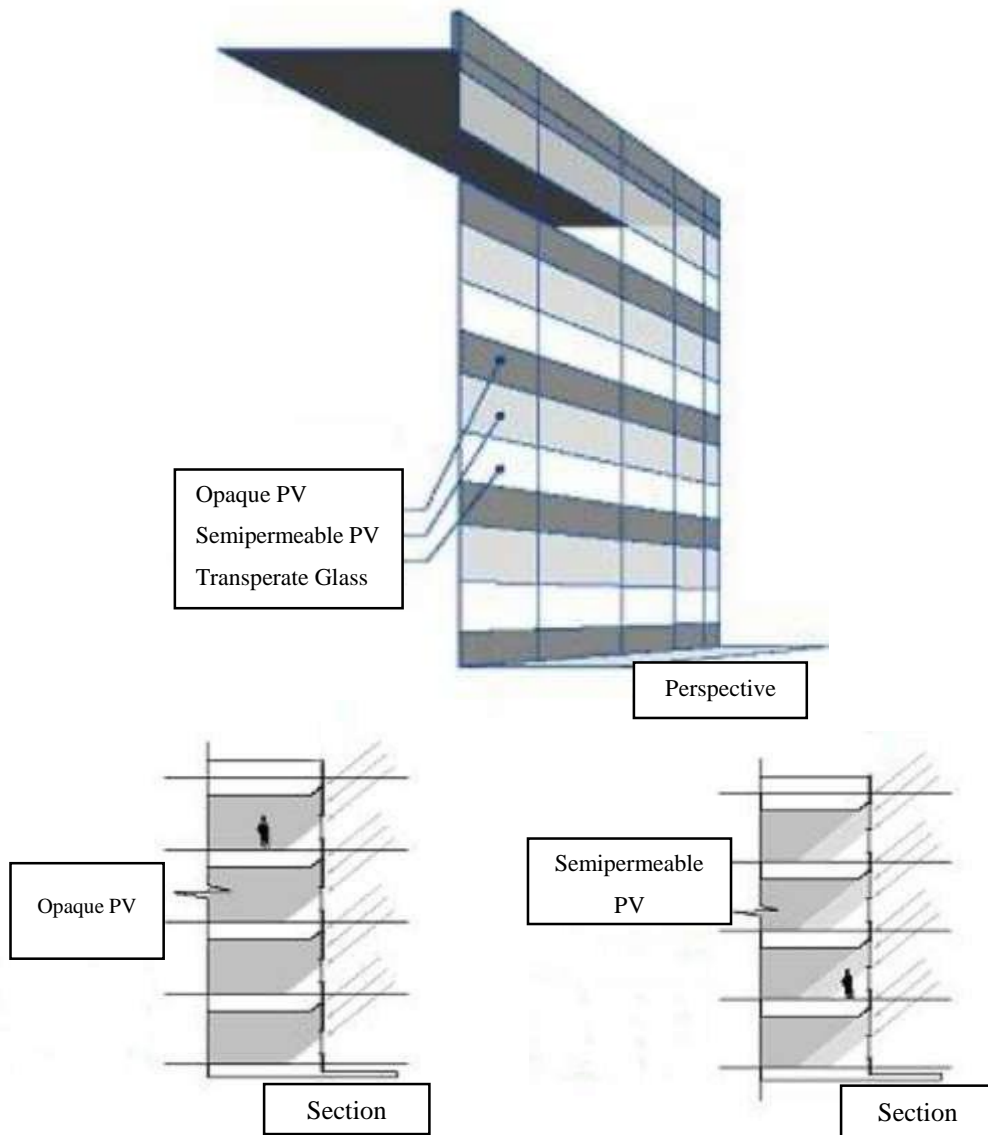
PV module use in planar curtain wall (Sayın, 2006)
